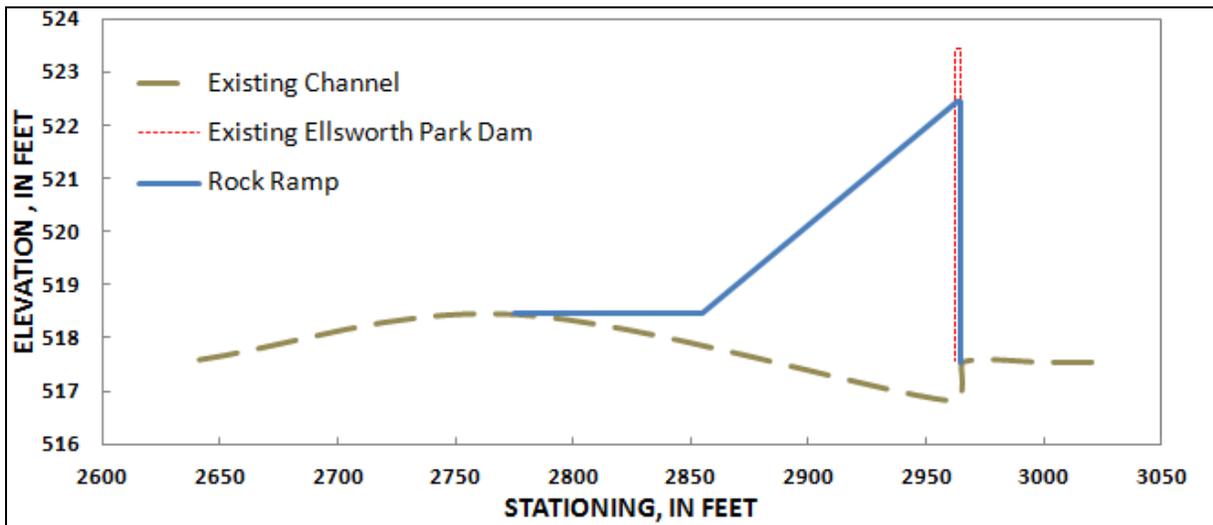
Ellsworth Park Dam Rock Ramp Profile
